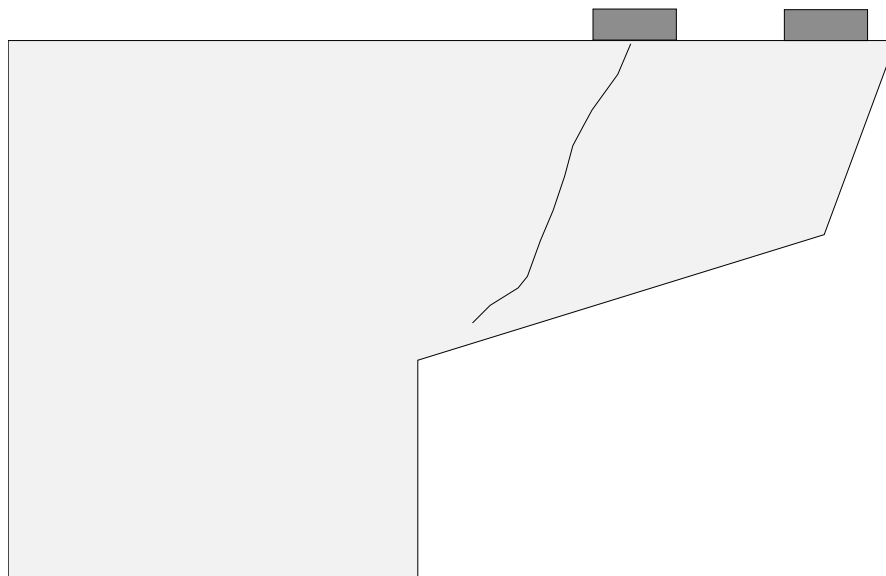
Location of Diagonal Crack in Pier I-4C
